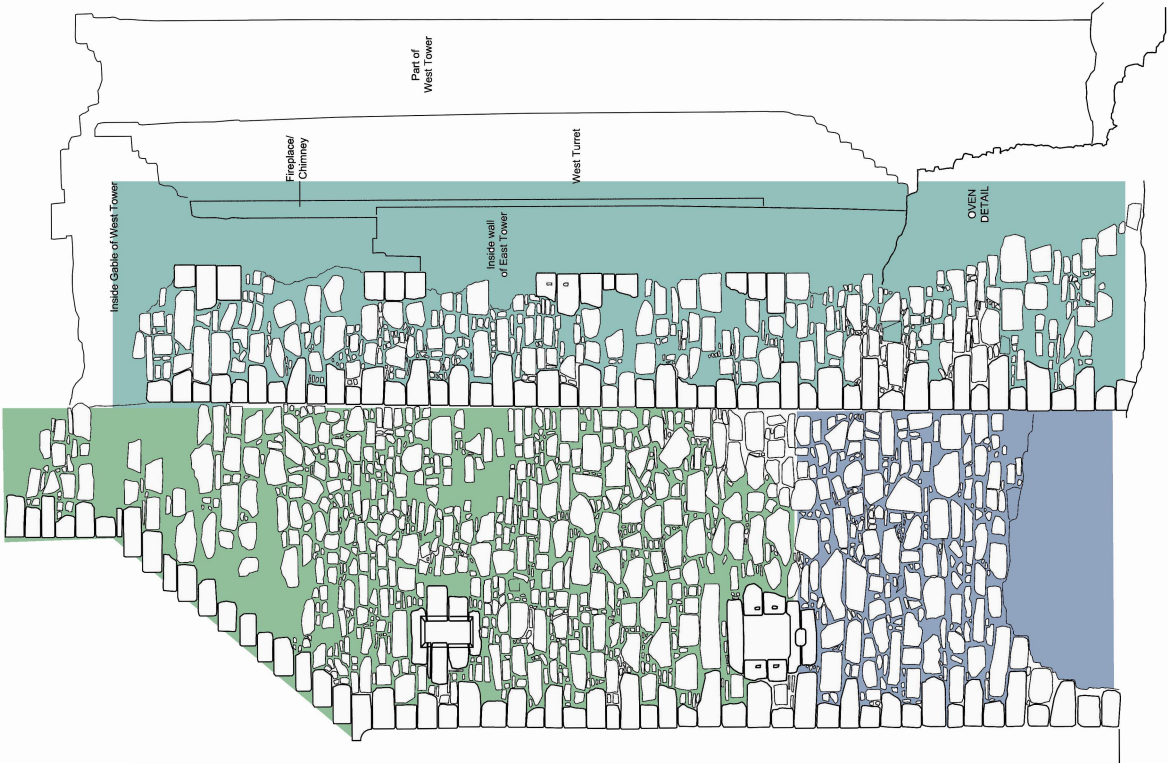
External east elevation: assuming original south wall of that tower, pre-alteration, is 15th century
